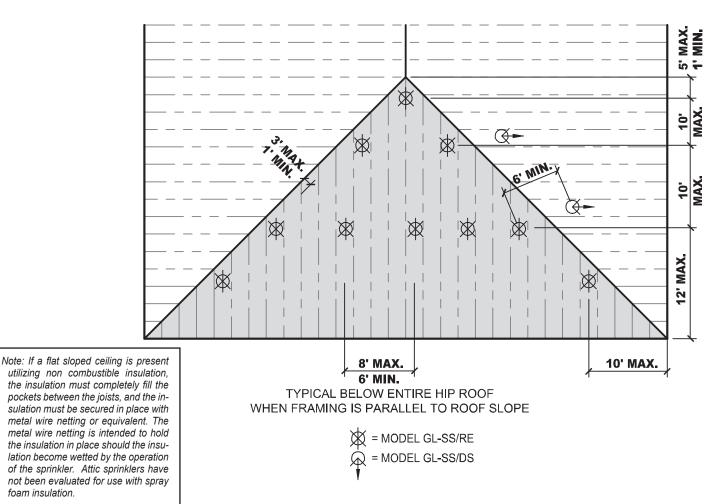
HIP LAYOUT CRITERIA FRAMING MEMBERS PARALLEL TO ROOF SLOPE
